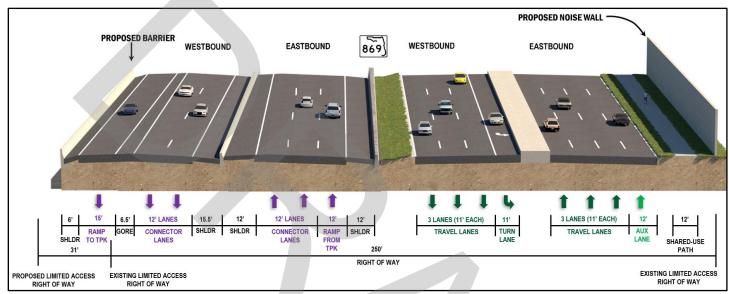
Preferred Alternative Roadway Section between Florida's Turnpike and Powerline Road
